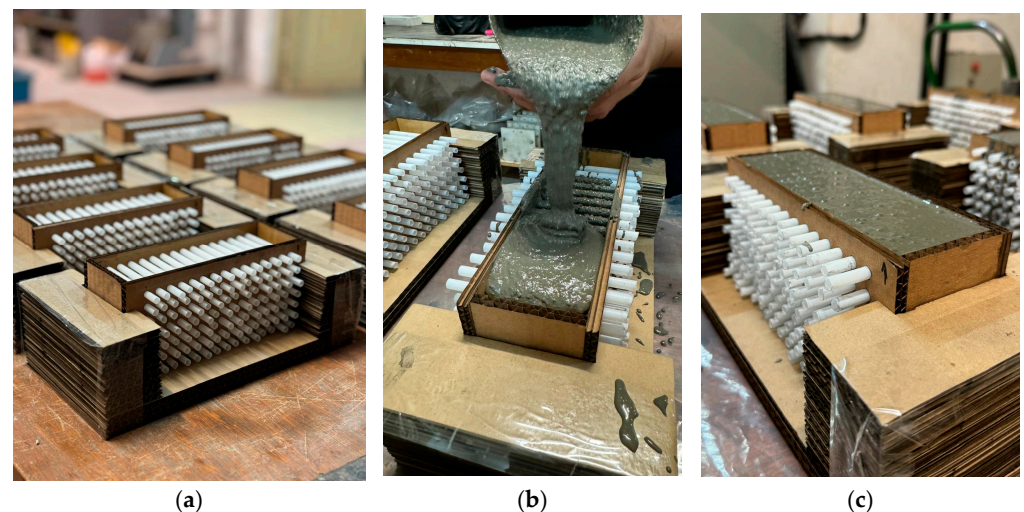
Sample preparation by casting. (a) prepared molds before casting; (b) UHPC mixture being cast into the molds; (c) mold fully filled with self-compacting UHPC mixture.
